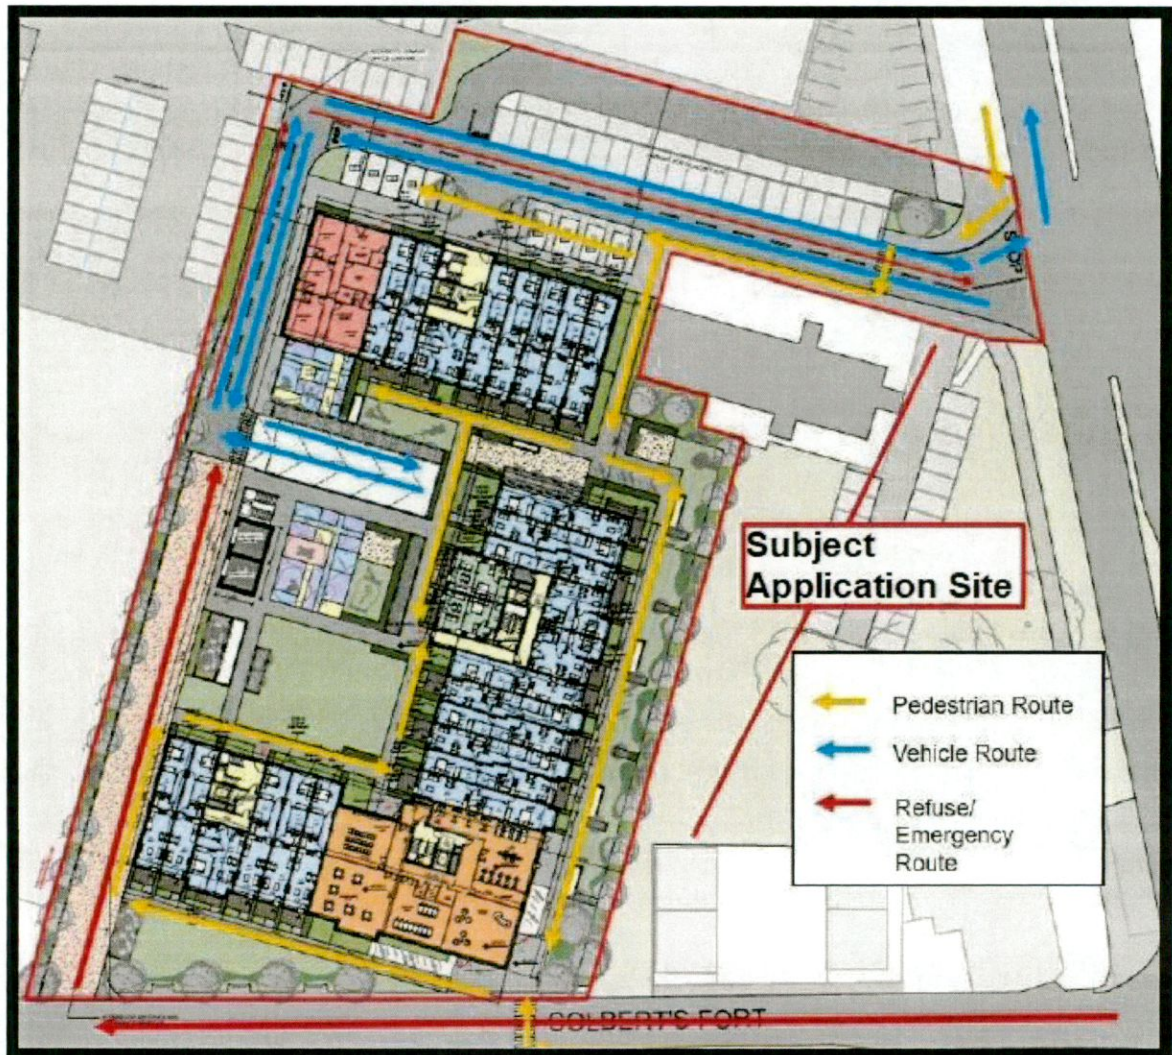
Adjacent Approved SHD - Ground Floor Layout Plan
